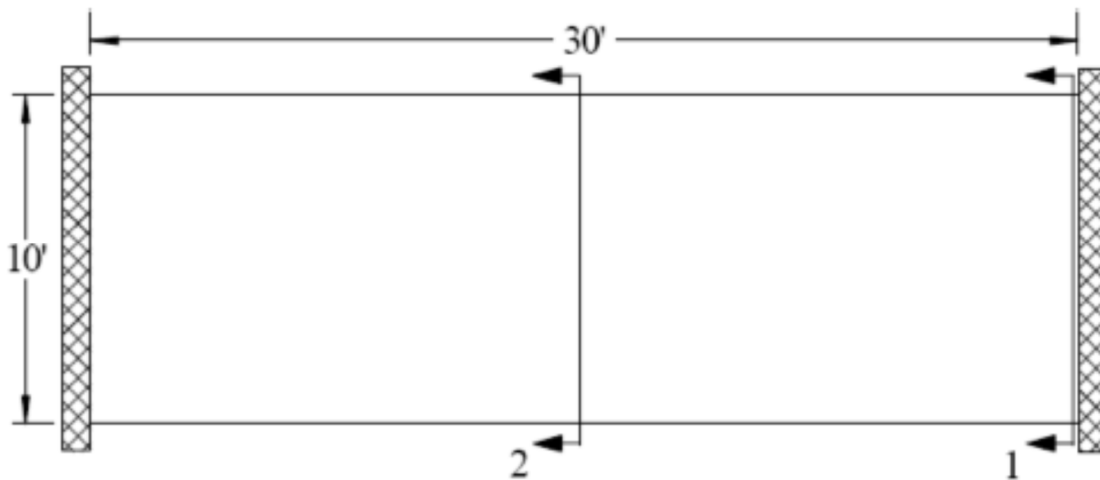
Example Flat Plate Structure (PLAN)
